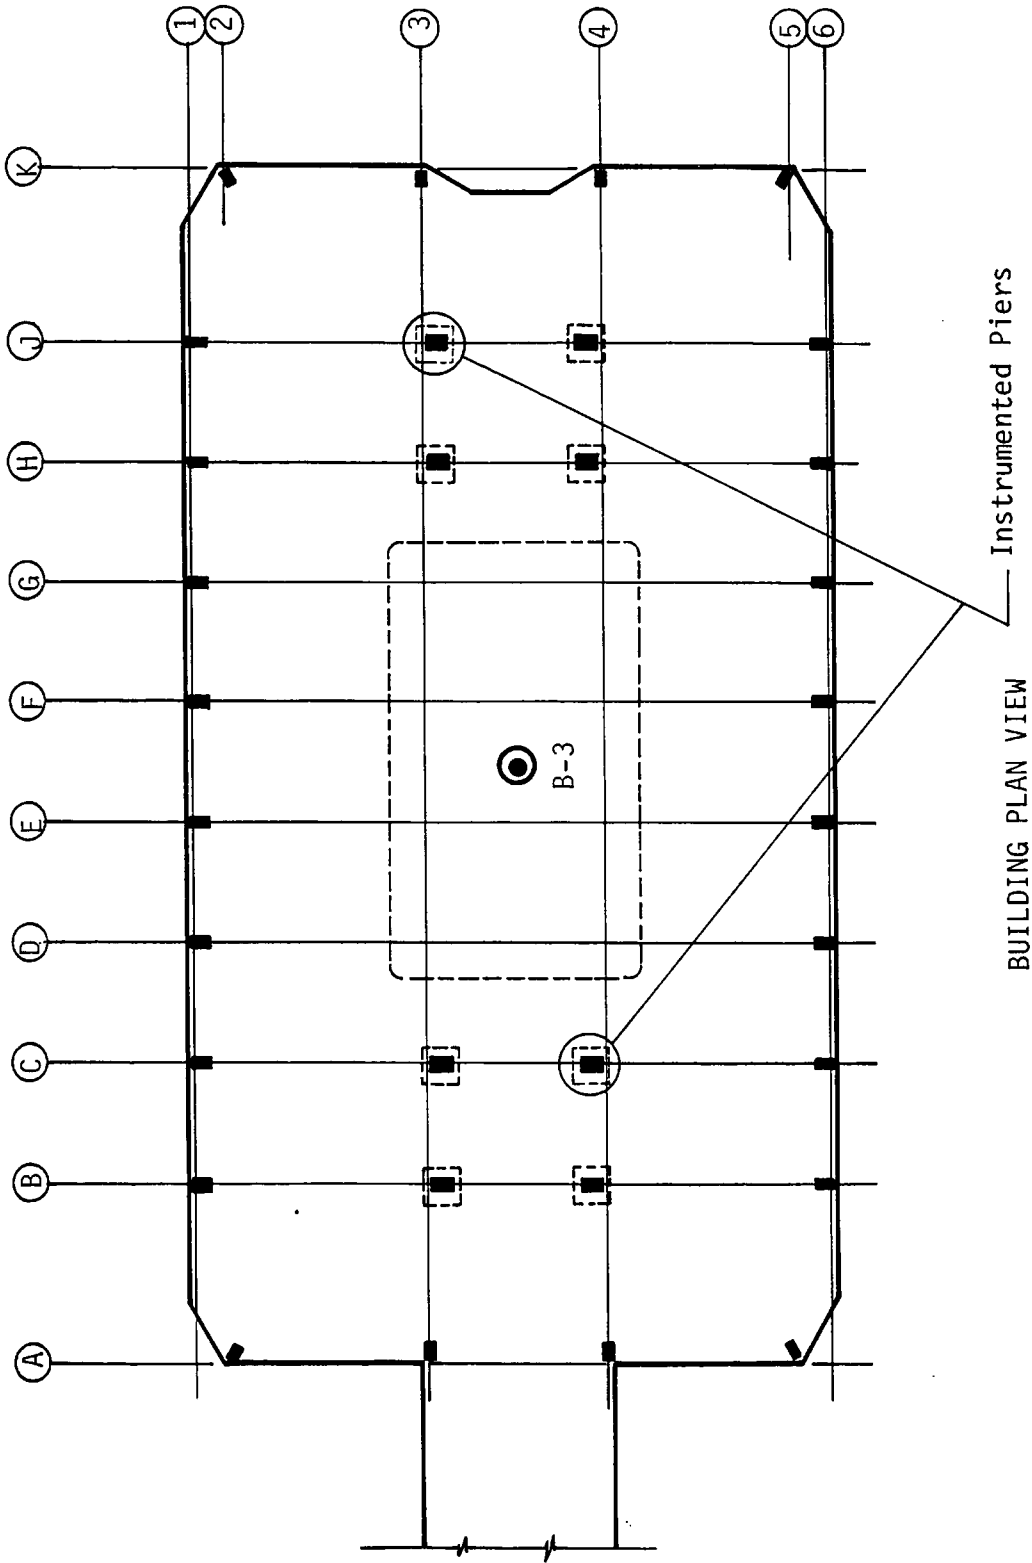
LOCATIONS OF INSTRUMENTED PIERS
